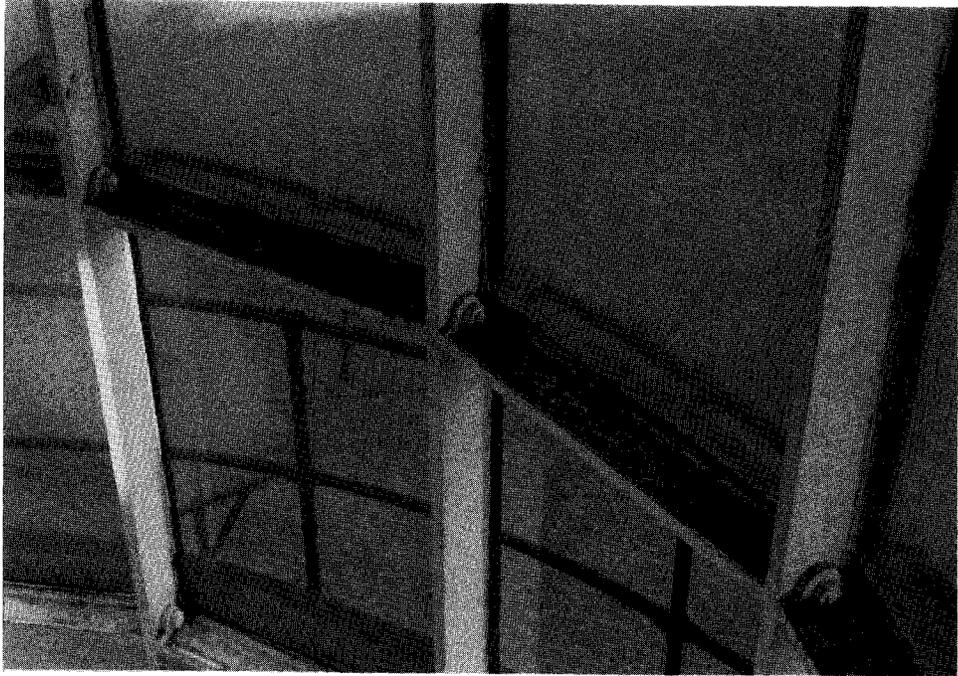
Tower, corrosion staining at horizontal mullions of Lantern Deck window wall.
